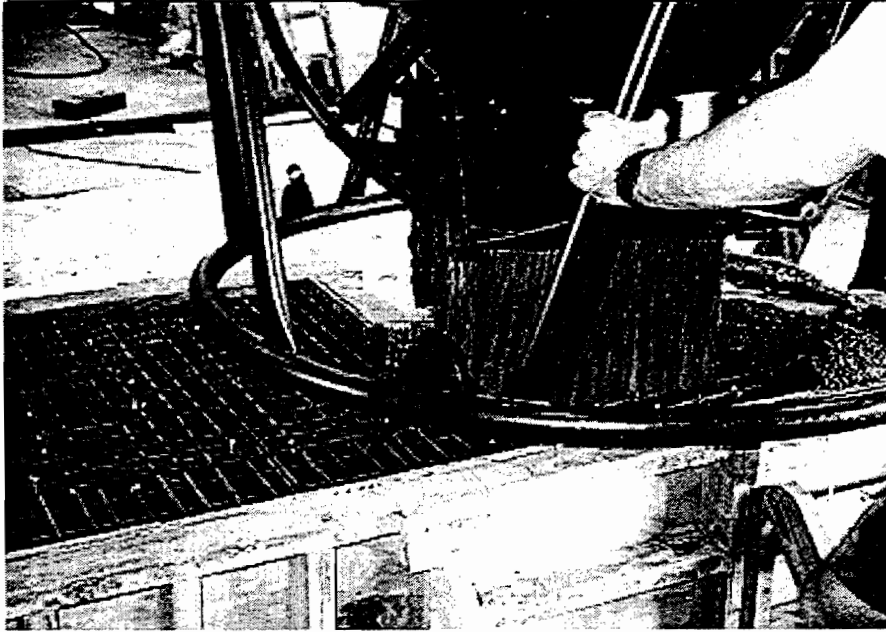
43 Casting of Specimen CO-PU-54S-TH
